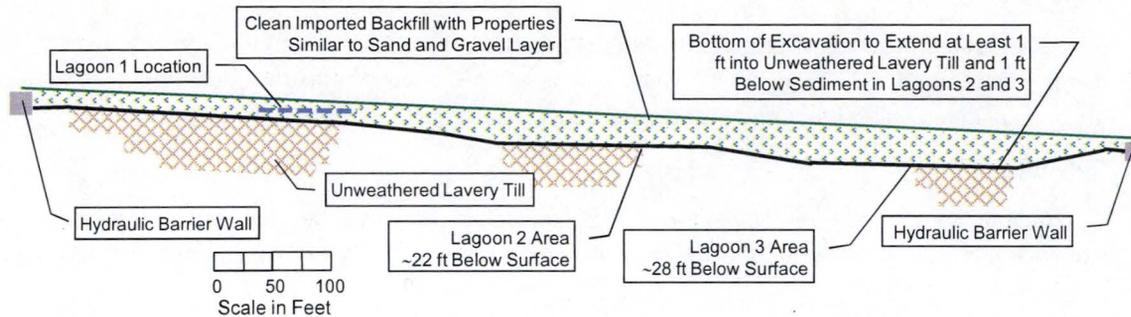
Conceptual Cross-Section View of the Backfilled WMA 2 Excavation
